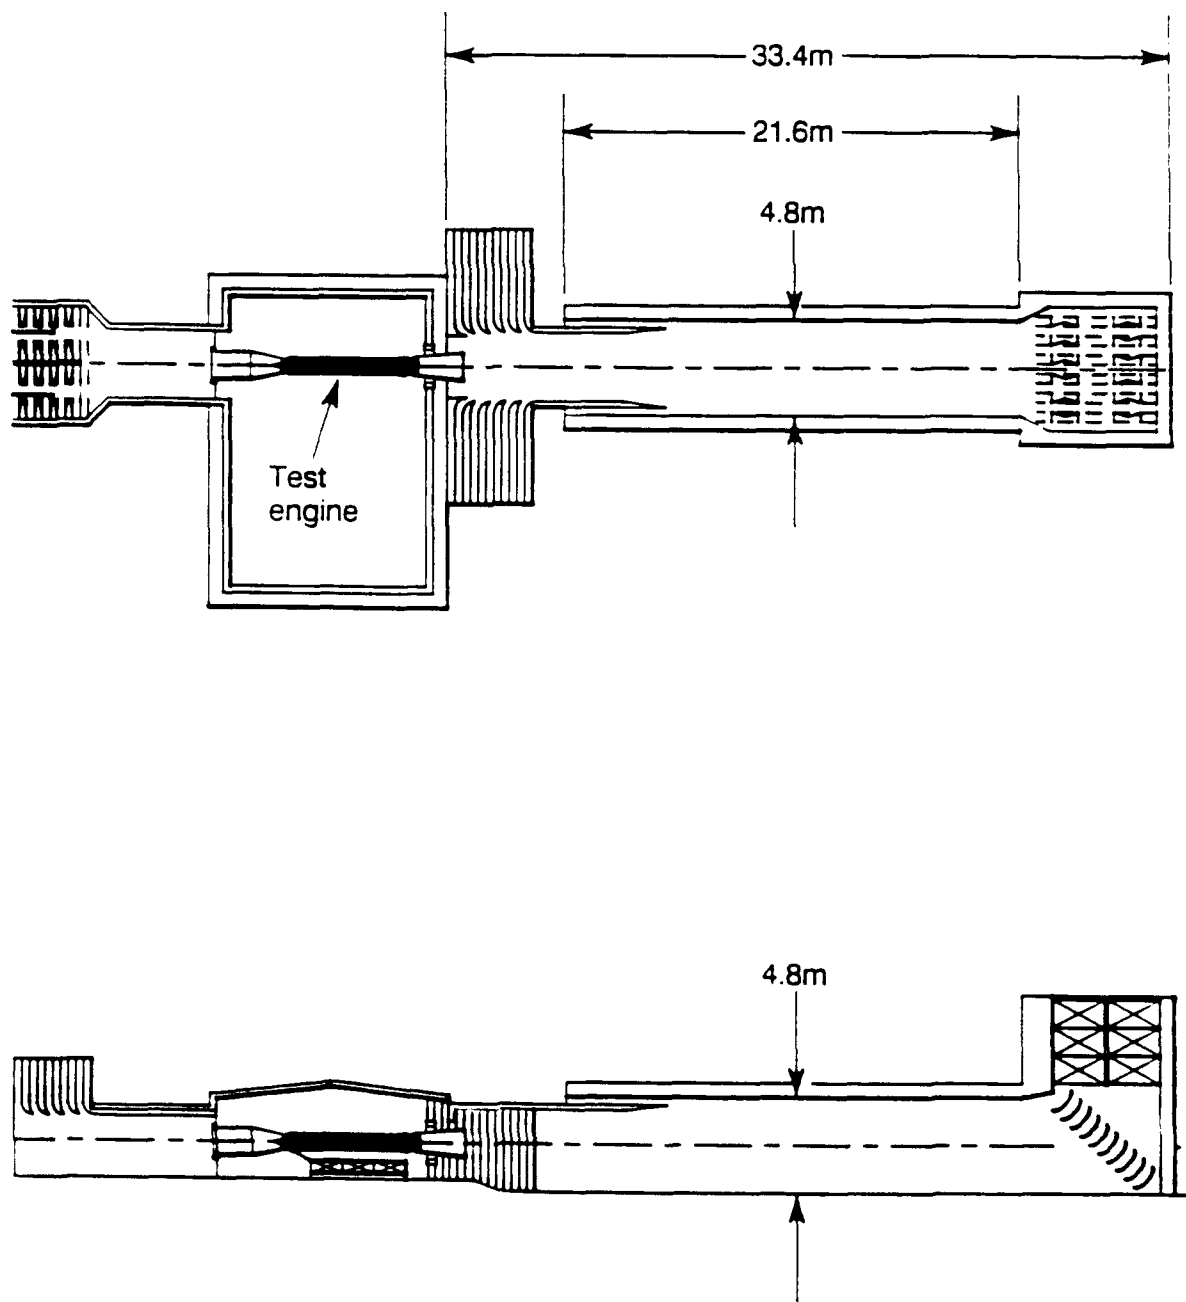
UNINSTALLED ENGINE TEST FACILITY - EARLY PROPOSAL
